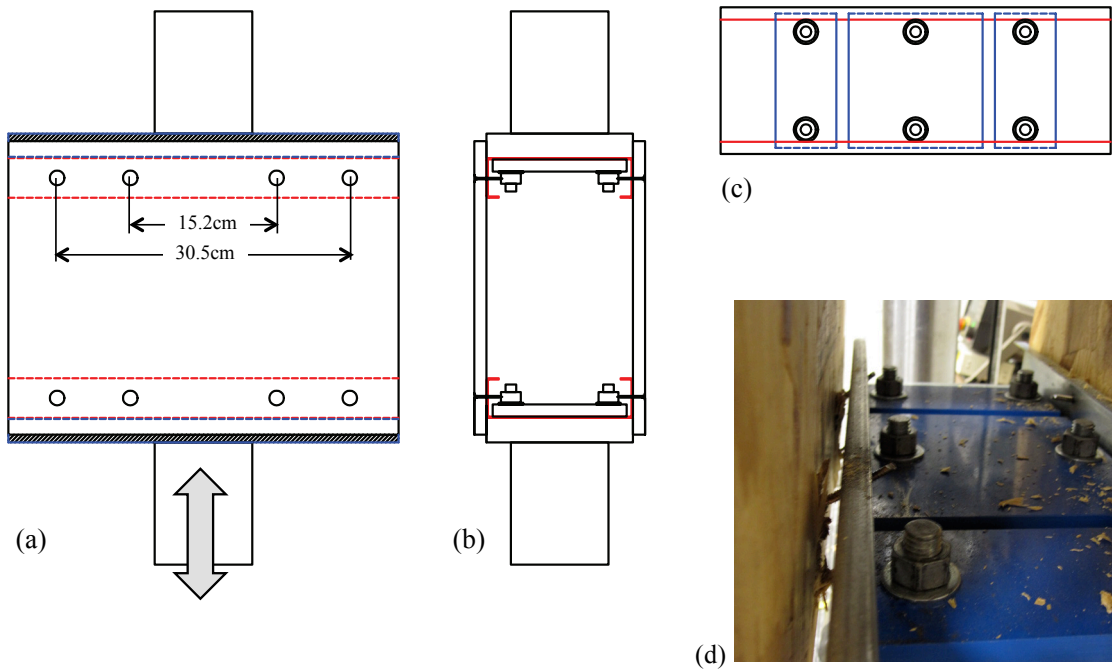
(a) Front view of loaded specimen, dashed lines indicate hidden stud, arrow indicates location and direction of loading (b) Side view of specimen in rig (c) Inside view of stud clamping system (d) photograph of clamping system
